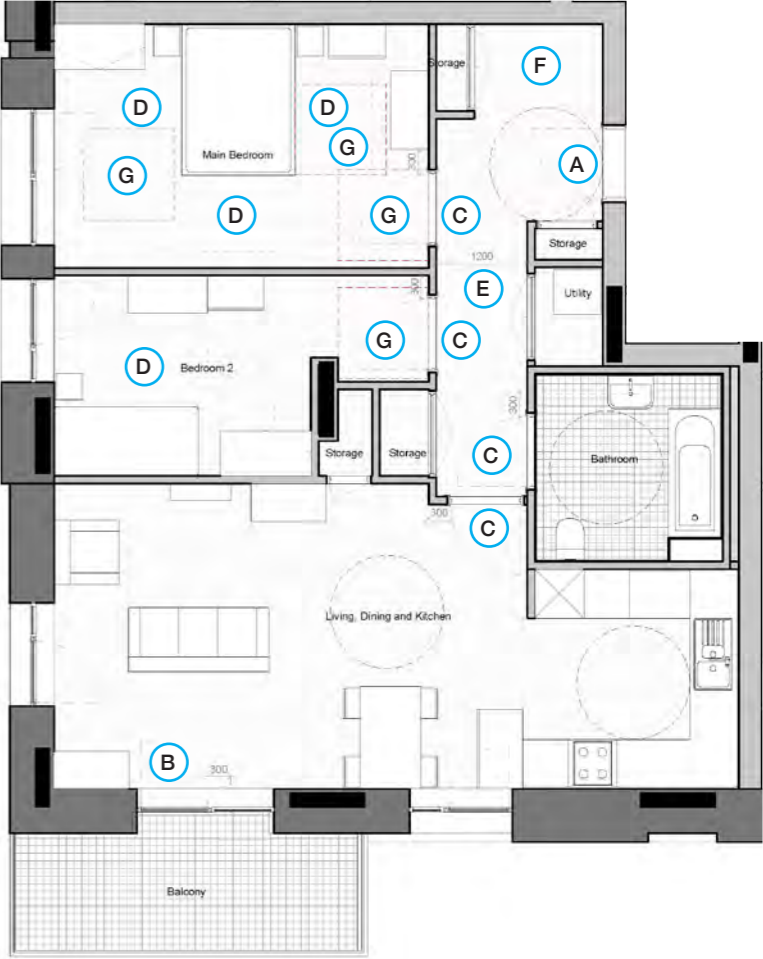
Typical 2 Bedroom 3 Persons accessible layout (Social Rent)
